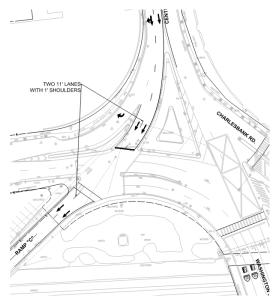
Southeast Quadrant Short-Term Alternative 1A Concept Plan
